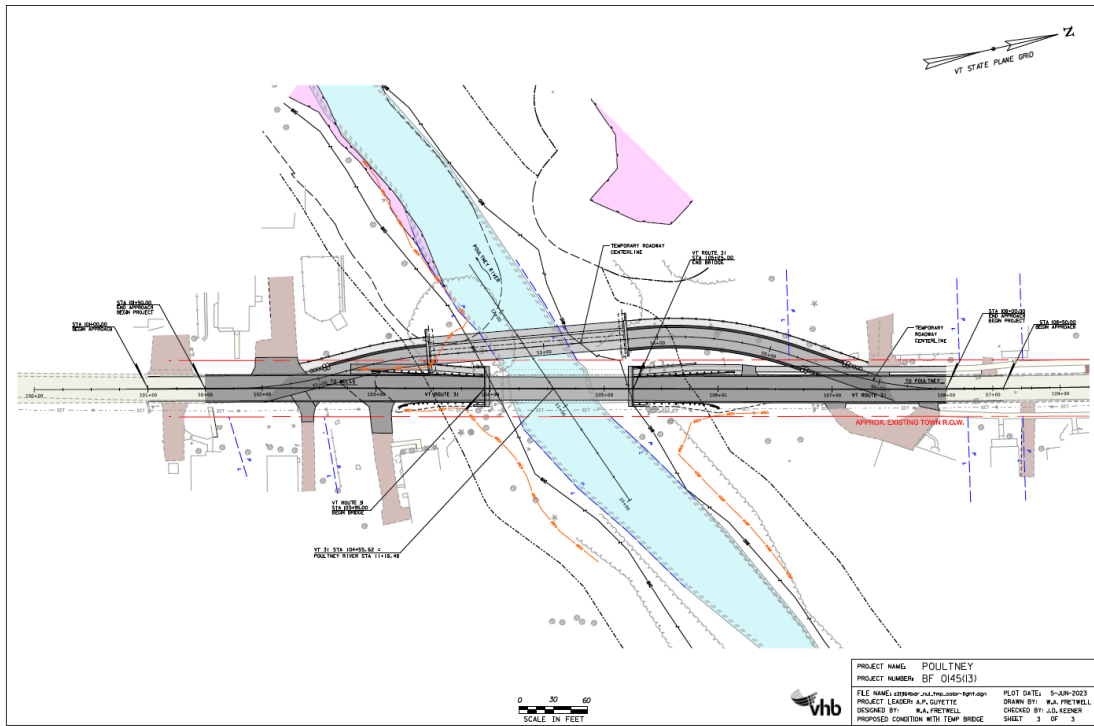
Proposed Condition with Temp Bridge, June 5, 2023.
